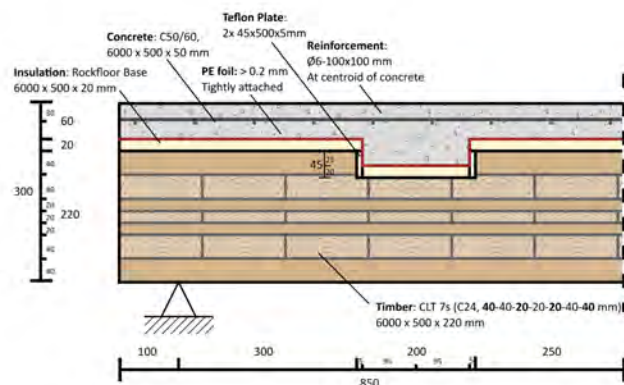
shows the chosen connection detail for the conceptual floor next to the connection
